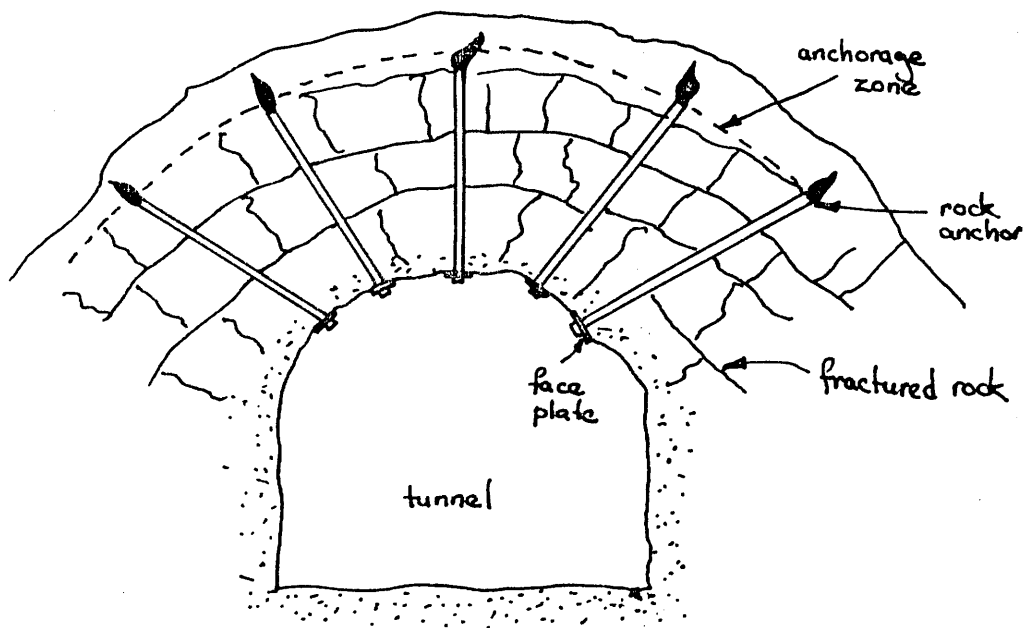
TYPICAL ROOF ANCHOR INSTALLATION.
